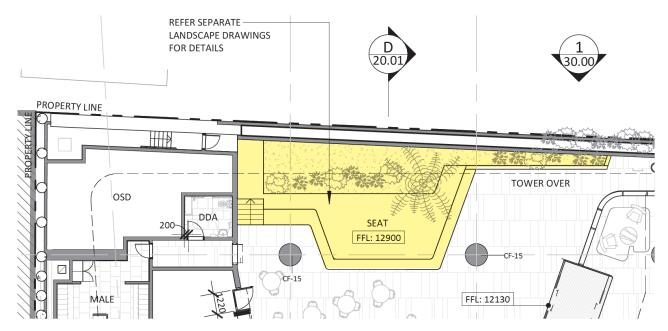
Proposed rear decking / breakout space Source: Tzannes + Blight Rayner
